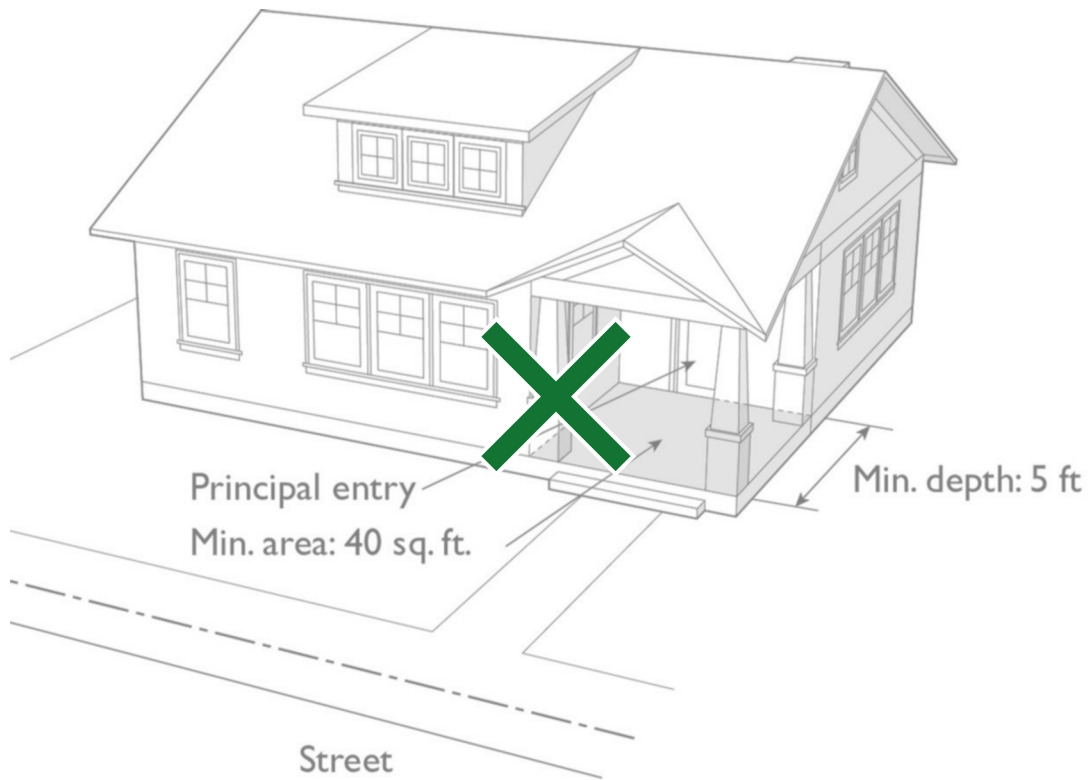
A-1: ENTRY LOCATION AND STREET CONNECTIVITY - RS DISTRICTS
